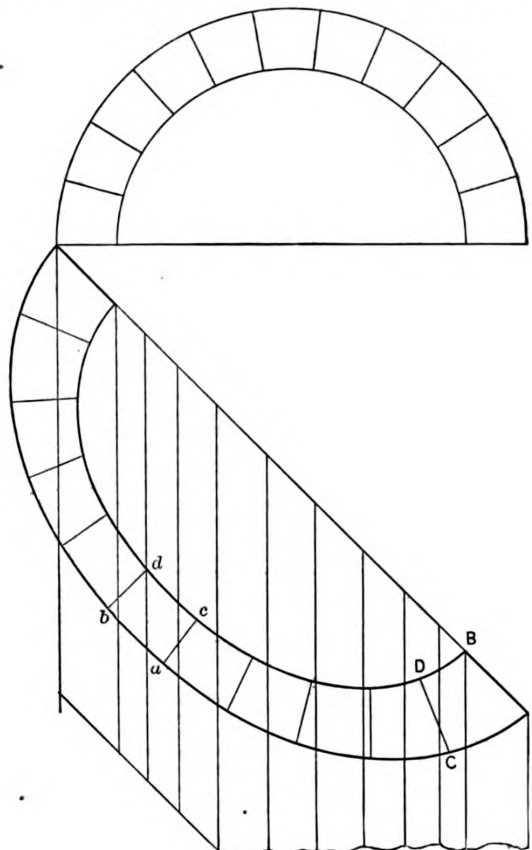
Plan and Elevation Showing Voussoirs Running Parallel with the Springing Plane.
